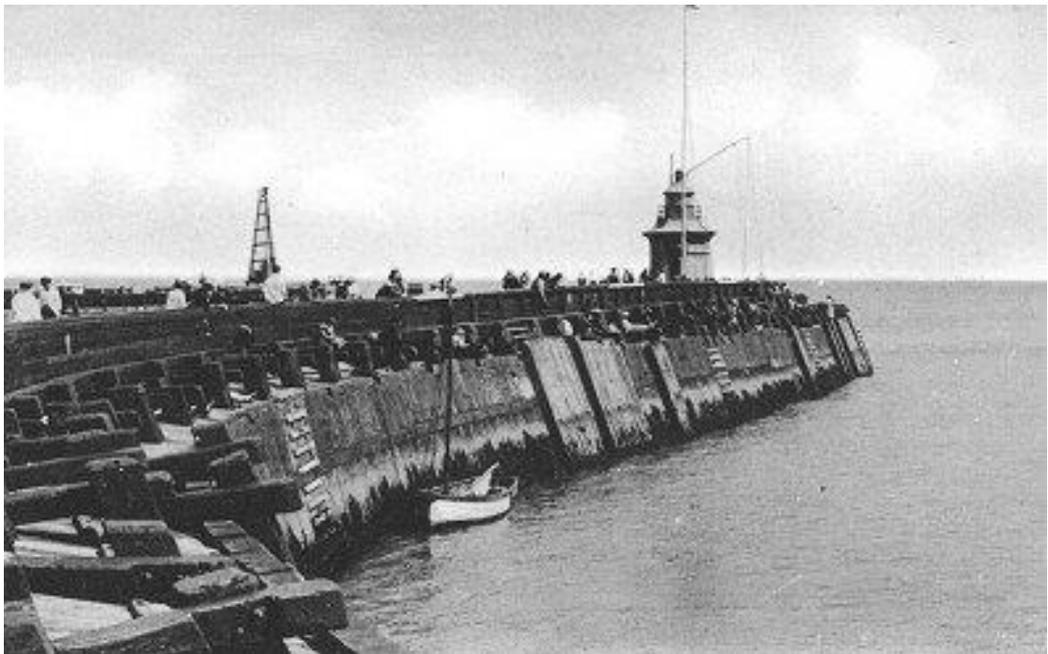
, North Pier Great Yarmouth, earlier 20th century. Note the short multiple stretches of tie-beam used to secure successive re-claddings (NOAH website)
